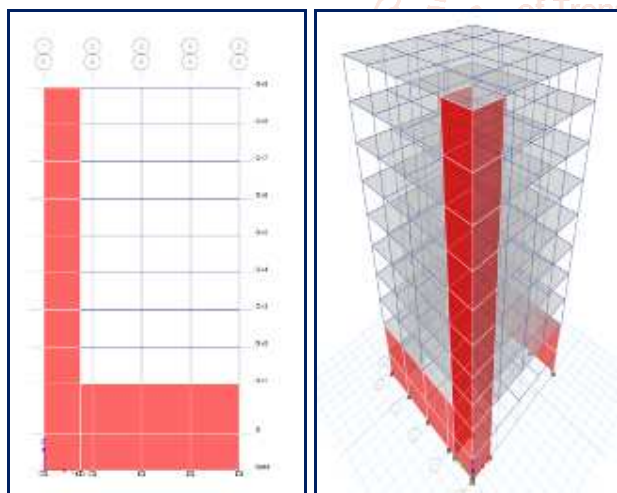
Elevation and Rendered View of Model 3 and Model 4: G + 8 Storied RC Structure with Single Column at Ground Storey for Zone IV and Zone V
